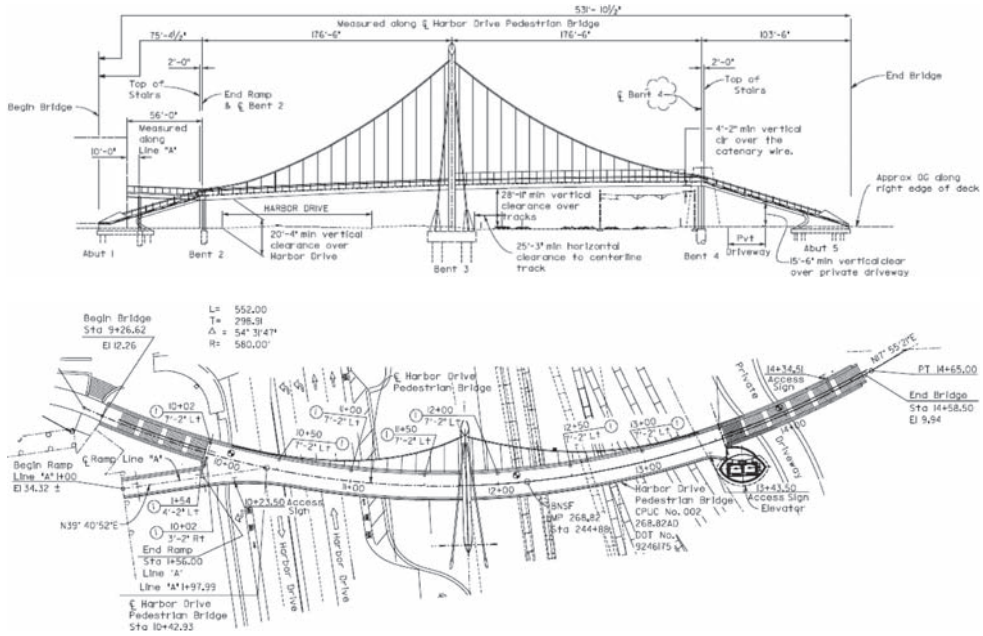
Plan and elevation of Harbor Drive Pedestrian Bridge (Fukuhara, 2006).
